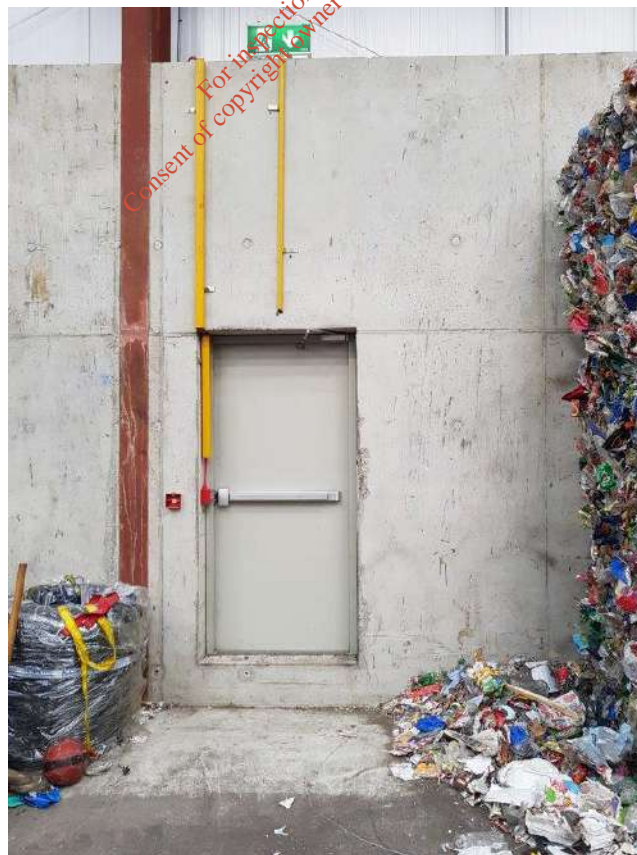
MRF Building: Emergency Exit in Bale Storage Area
